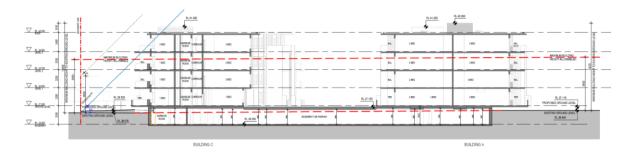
Sections for Building A and C (Source: Group GSA Architects)
